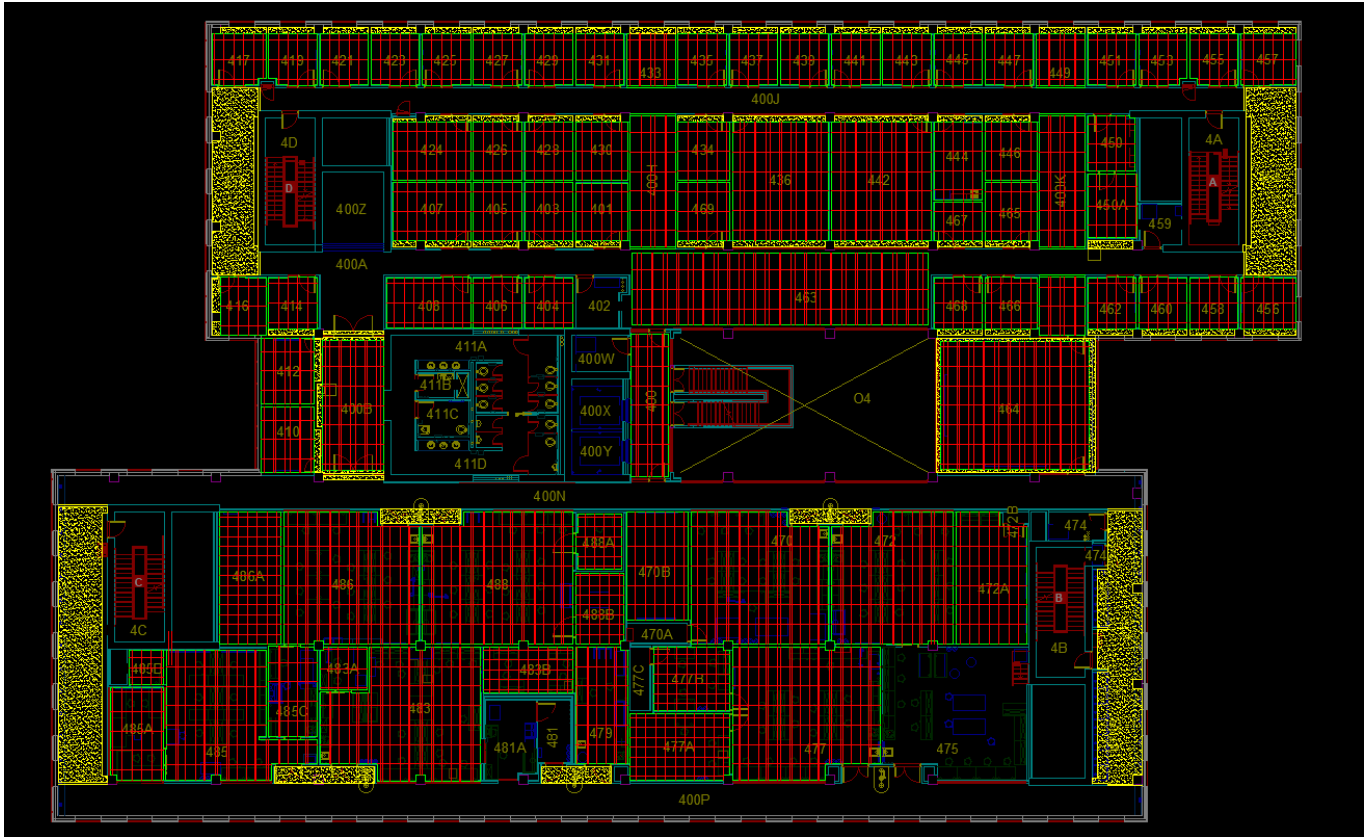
Working AutoCAD file of Reflected Ceiling Plan
